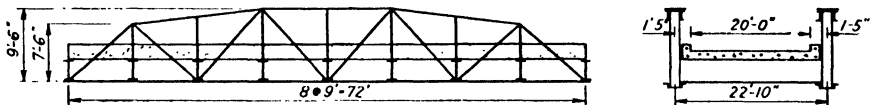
LOW TRUSS HIGHWAY BRIDGE.
